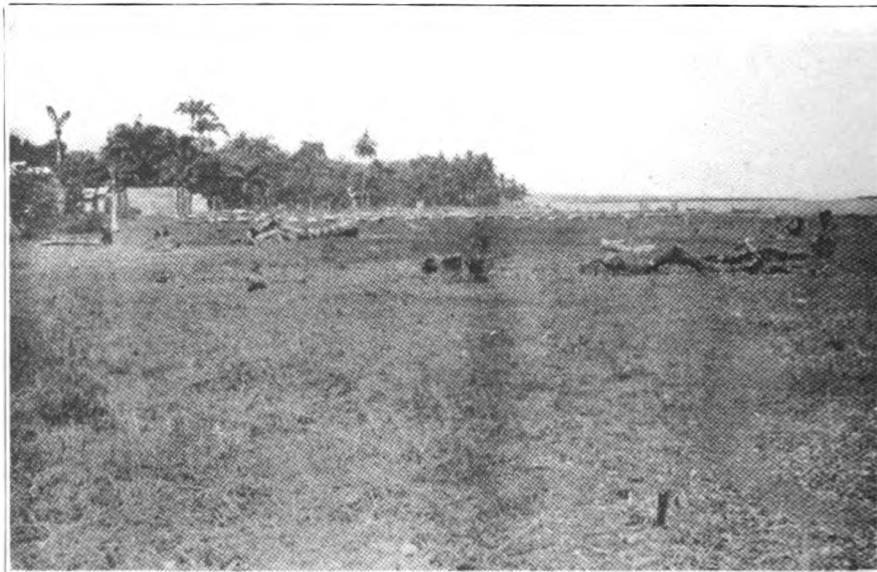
FIG. D.—DRAINING SWAMPS. NOTE ONE-THIRD SECTIONS OF CEMENT
